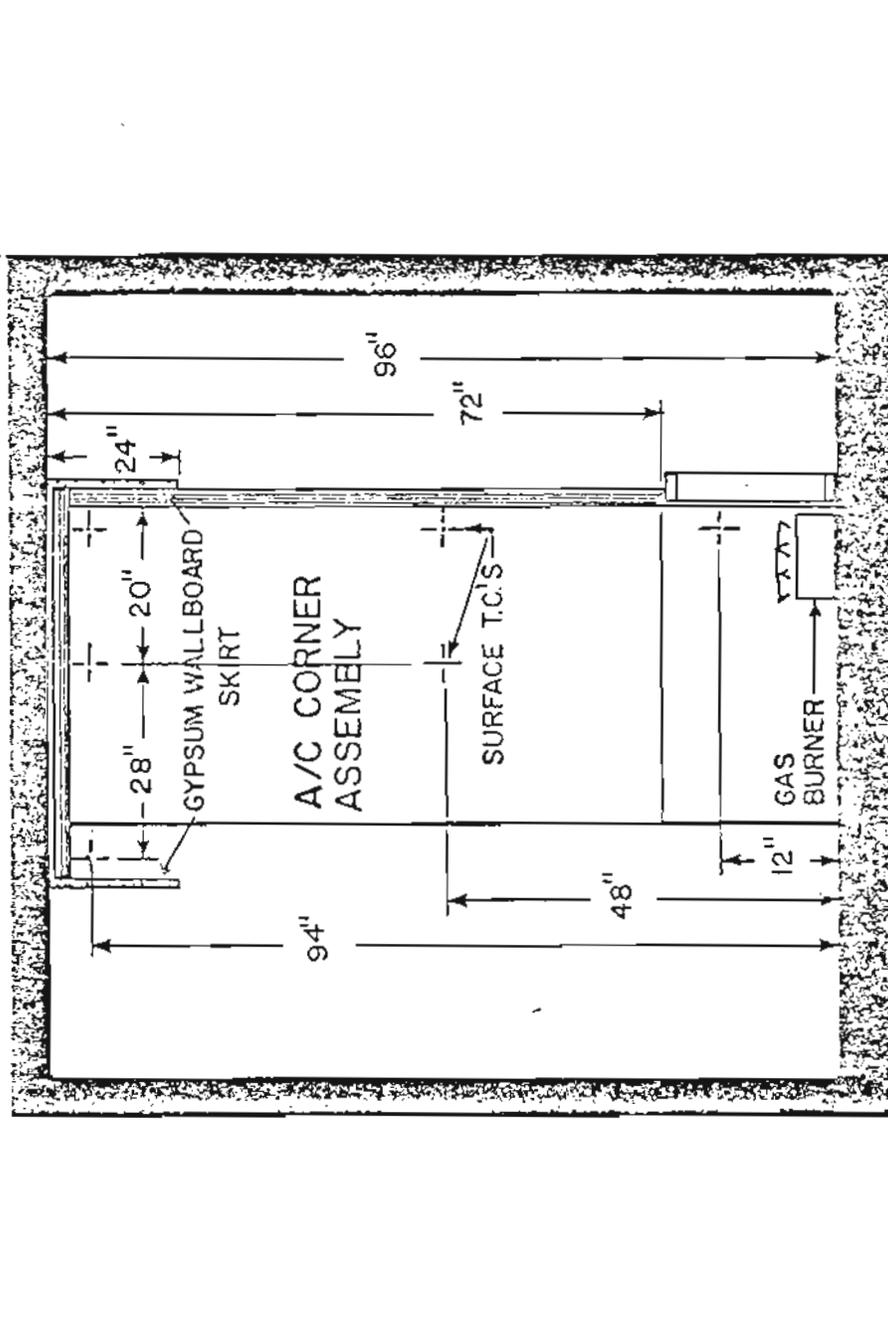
A Sectional View A-A Through the Drawing of the A/C Corner Assembly shown in Figure 1.
